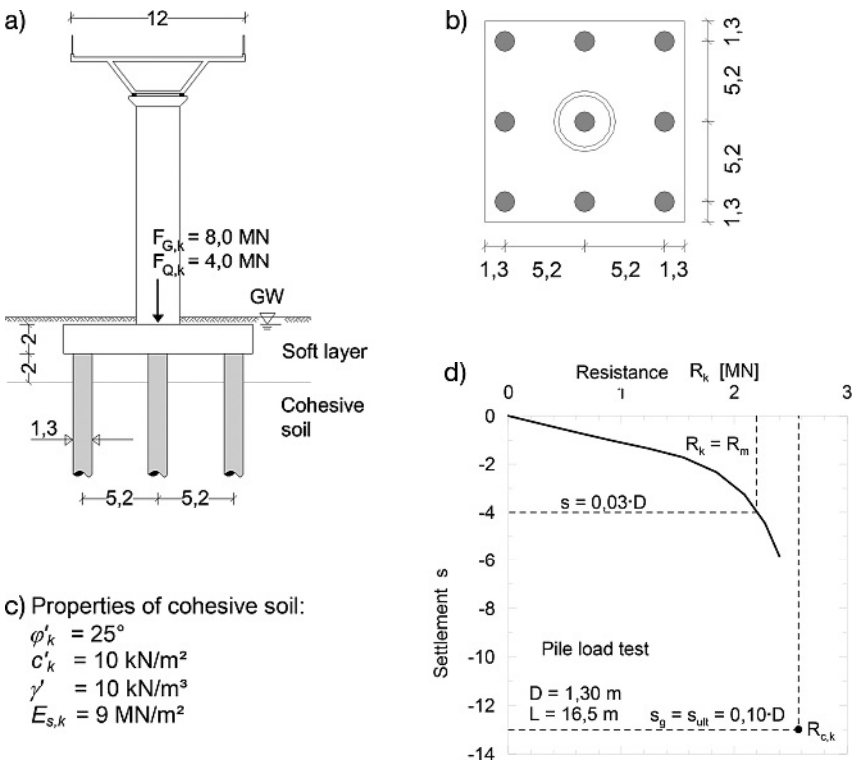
Pillar foundation on 9 piles, a) elevation, b) plan, c) soil parameters, d) characteristic resistance-settlement curve for a similar individual pile from a pile load test; lengths in [m]
